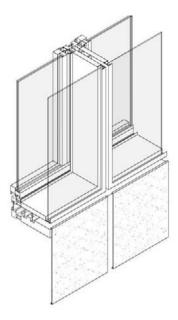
Detail solution of the hybrid façade: developed as an element façade, serpentine and prefabricated elements are suspended from the floor/ceiling slab.
